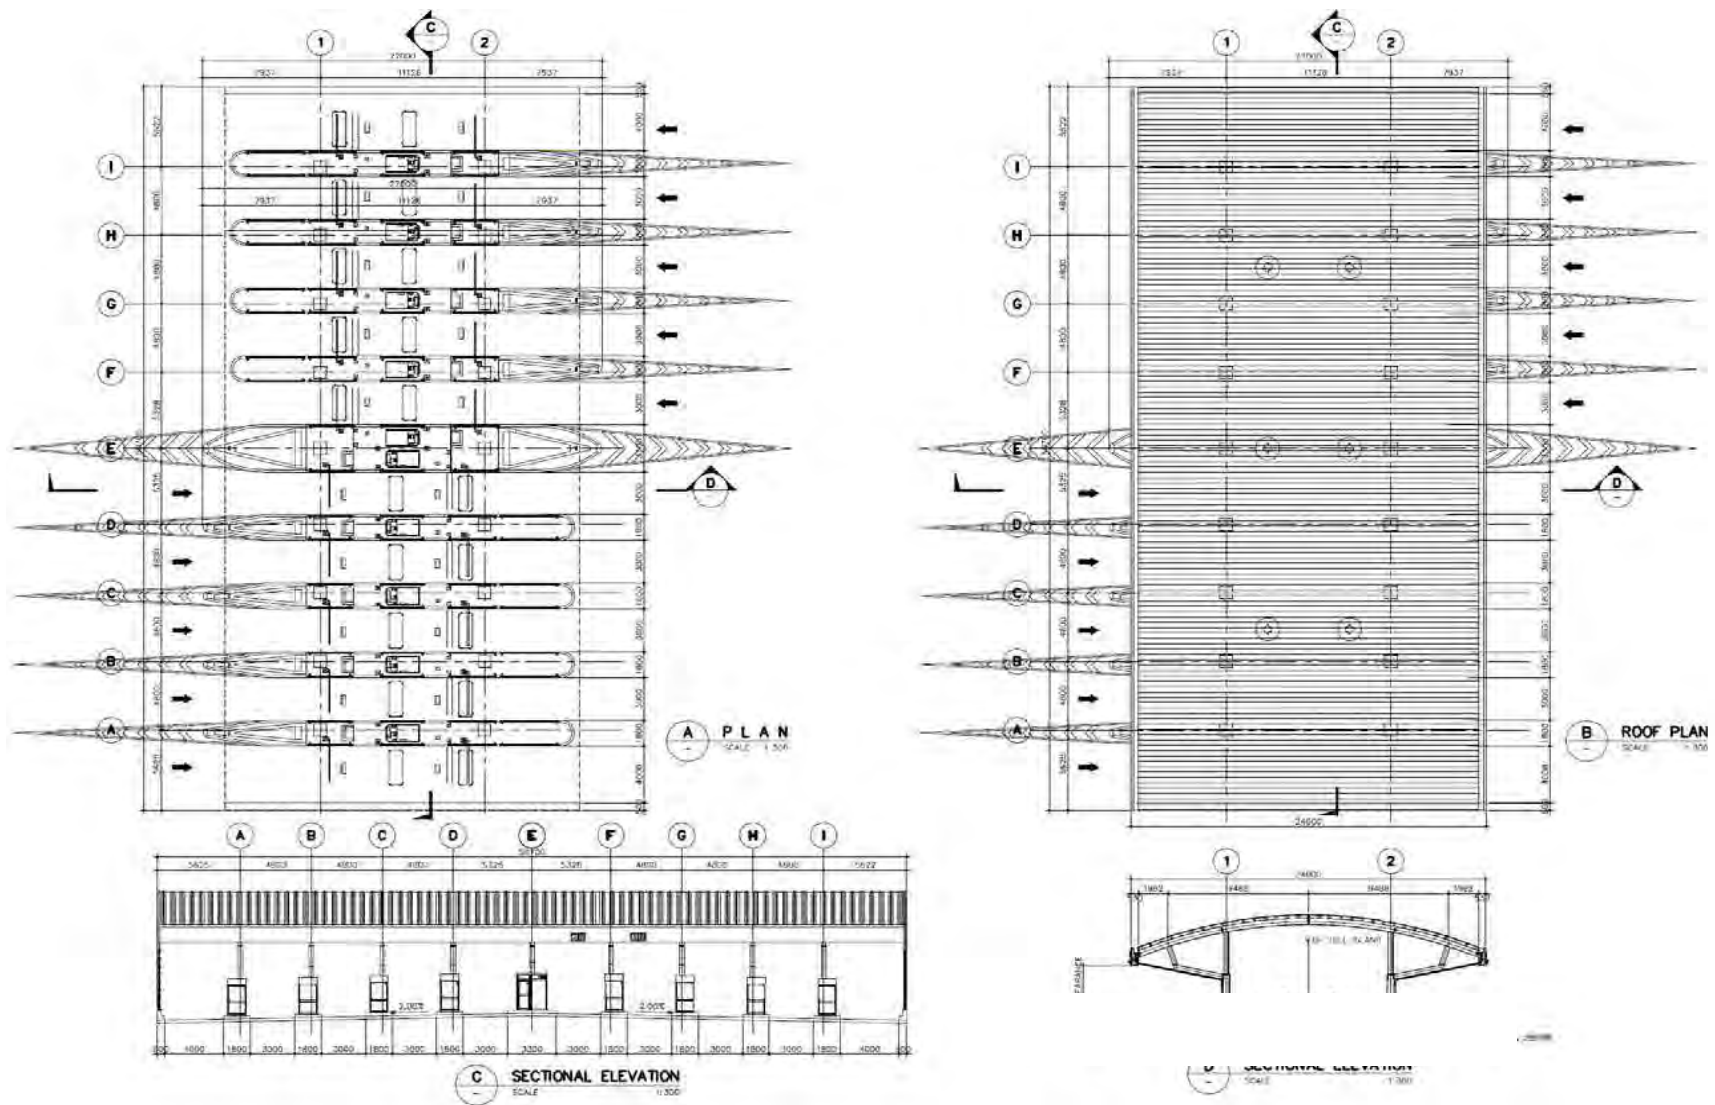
(2) TYPICAL DRAWING OF TOLL BOOTH LAYOUT (9BOOTHS)
